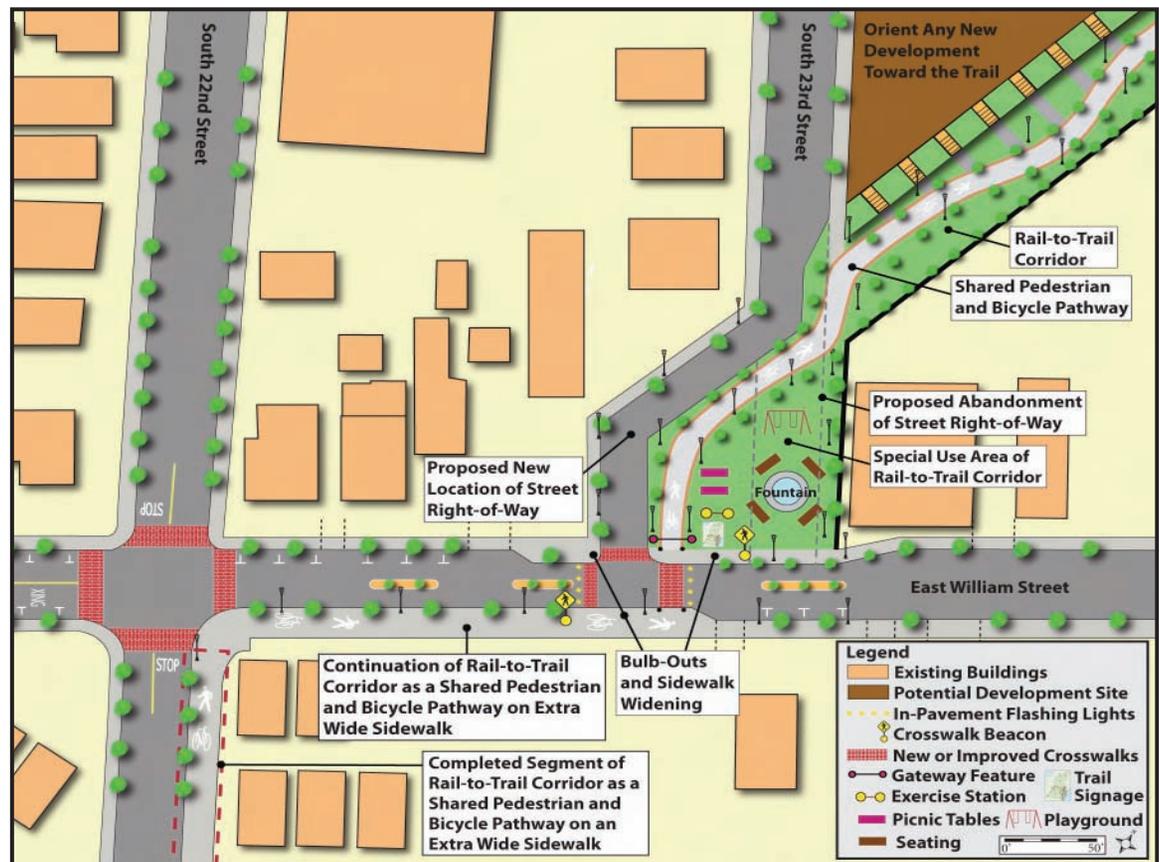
Detail plan of proposed reconfiguration of South 23rd Street.
